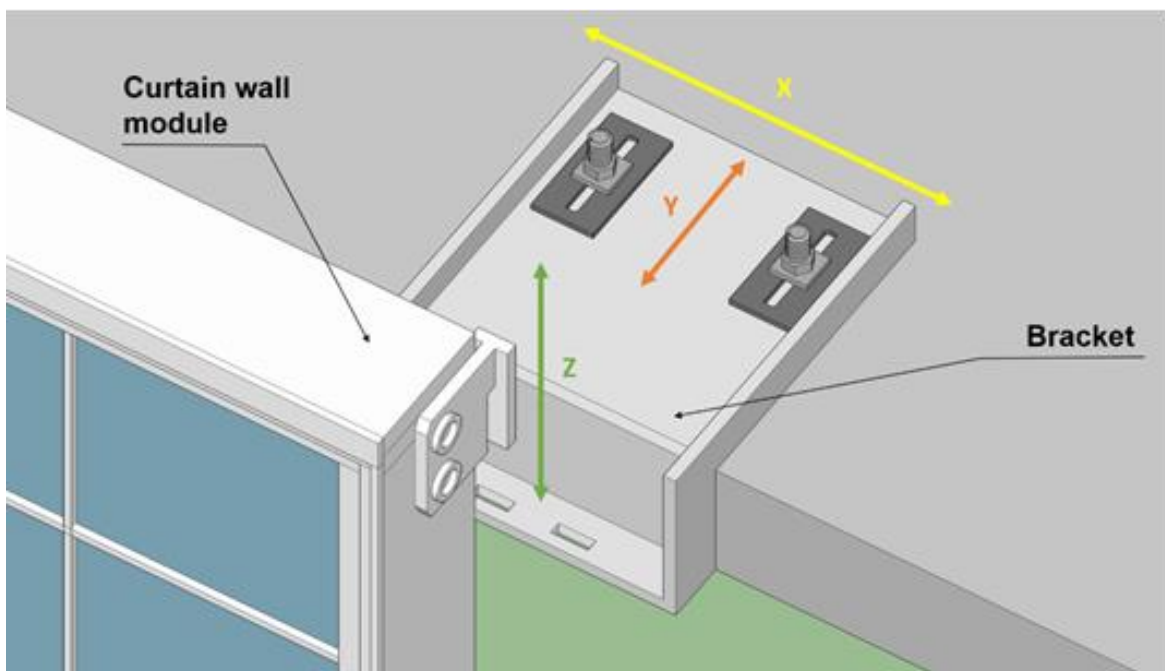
Schematic diagram of a typical bracket on the concrete building floor and its connection with a CWM module (the drilling technique)
